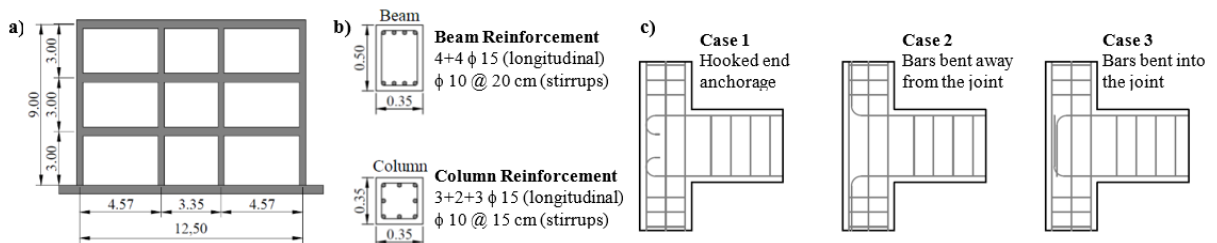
(a) geometric characteristic of the frame; (b) reinforcement details of beams and columns; (c) alternative cases for beam-column joints.
